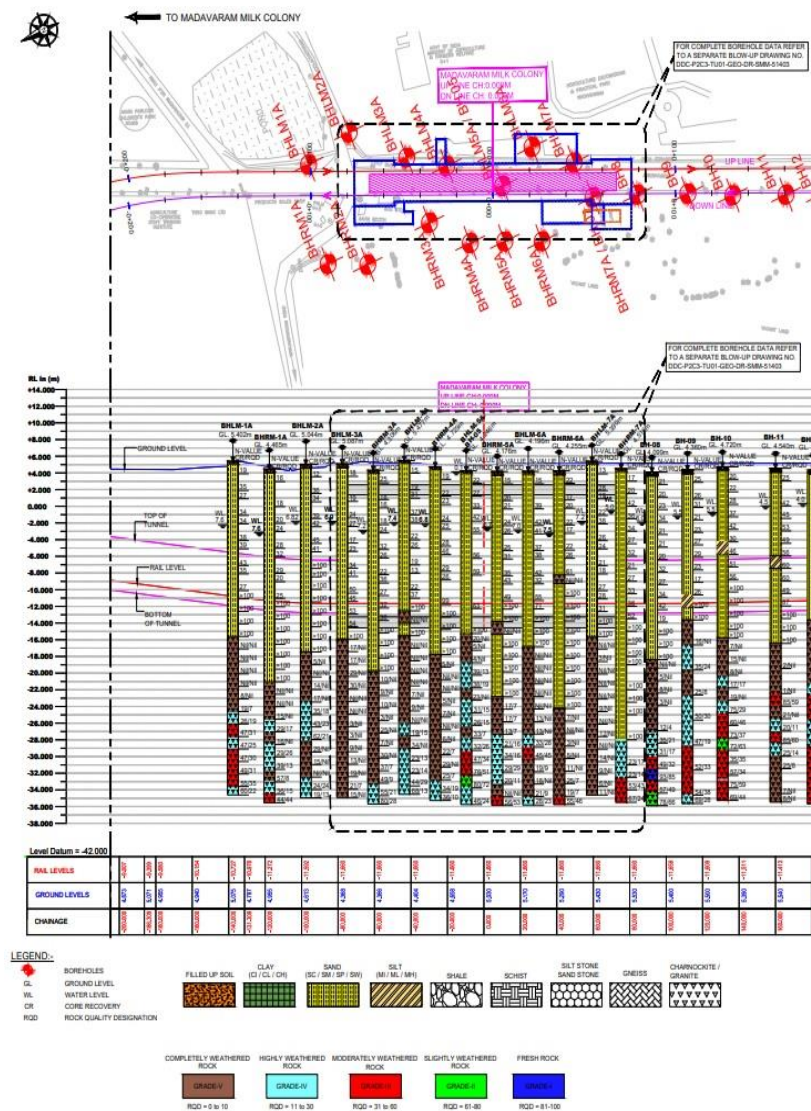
Geotechnical Interpretation of diaphragm Wall at site.
